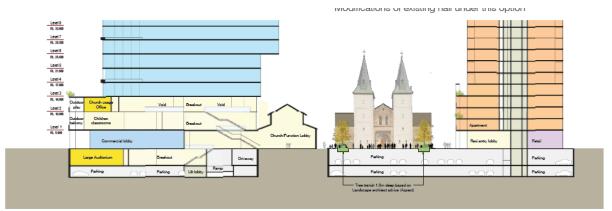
Section showing development option 2 (Source: Planning proposal)
